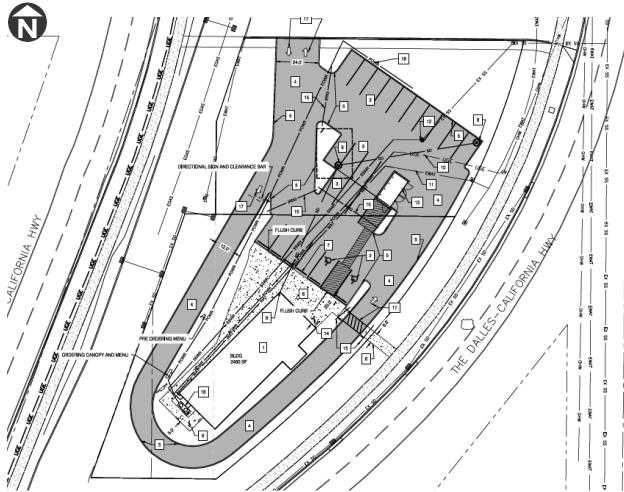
Preliminary site layout. Source: Steele Associates Architects, November 22, 2021.
